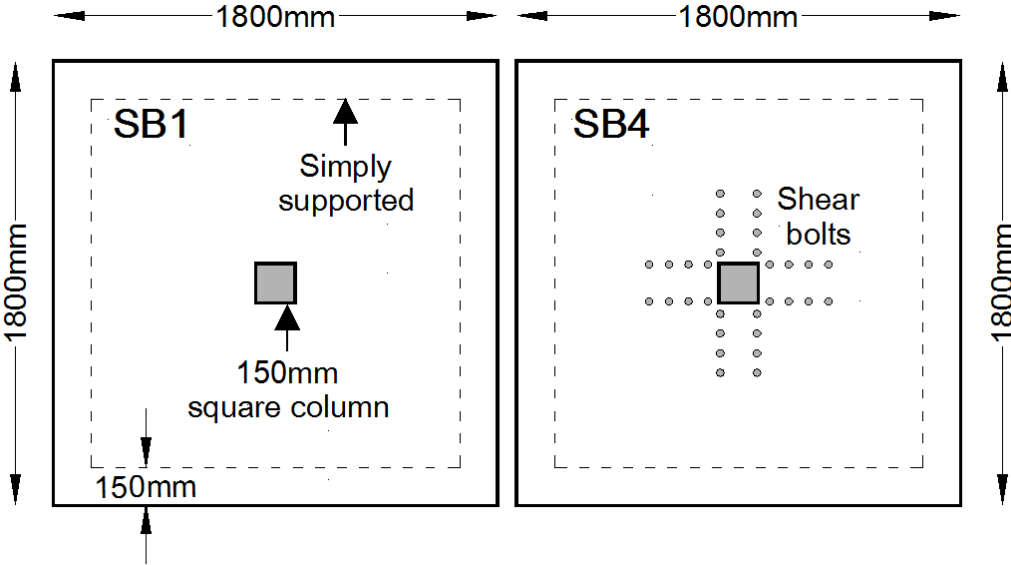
Schematic drawing: Specimen without shear bolts (SB1) and with shear bolts (SB4).
